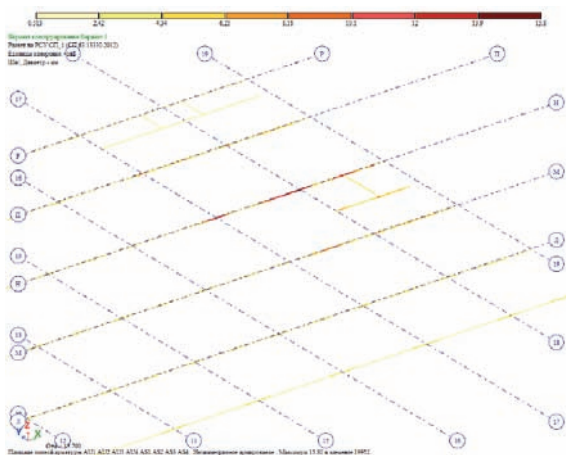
Required reinforcement in beams 40x80 mm (fragment)
